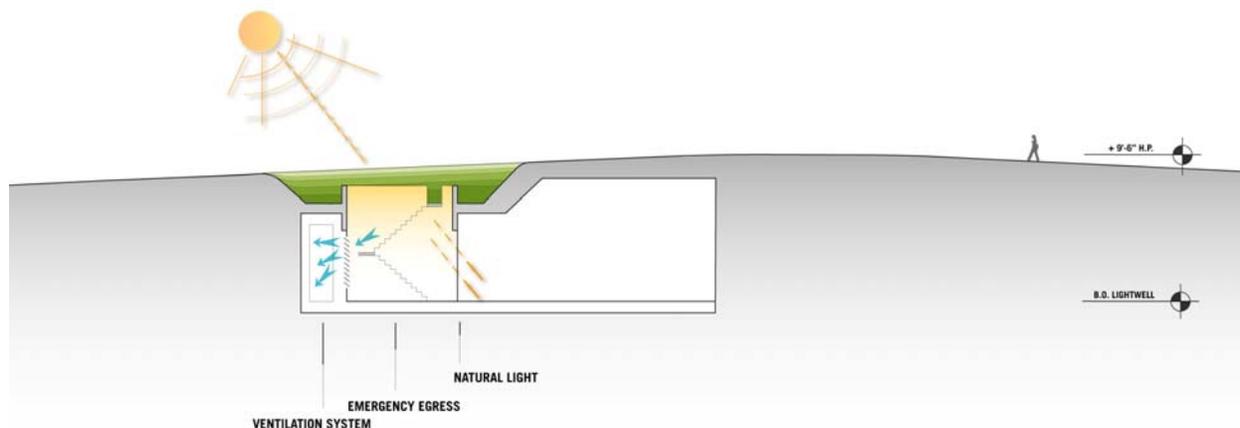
Center Design Strategy: Building Health and Safety – Profile Detail View
